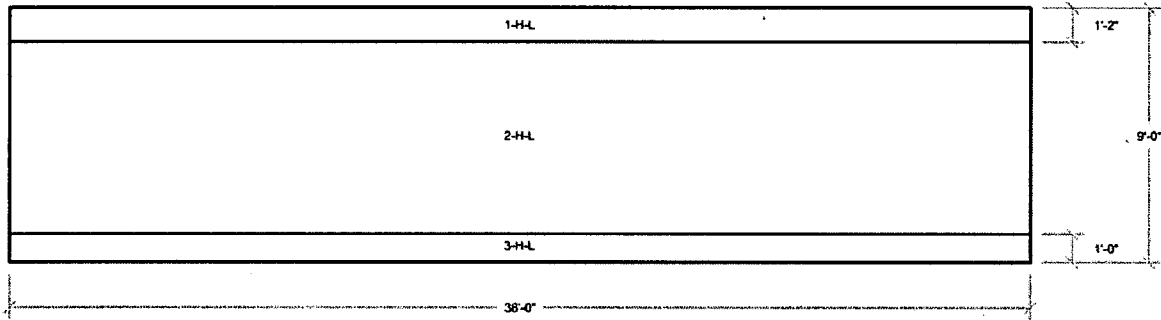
H.7-11: Tunnel Walls Looking From Outside Horizontal Reinforcement Zones Near Side Face
